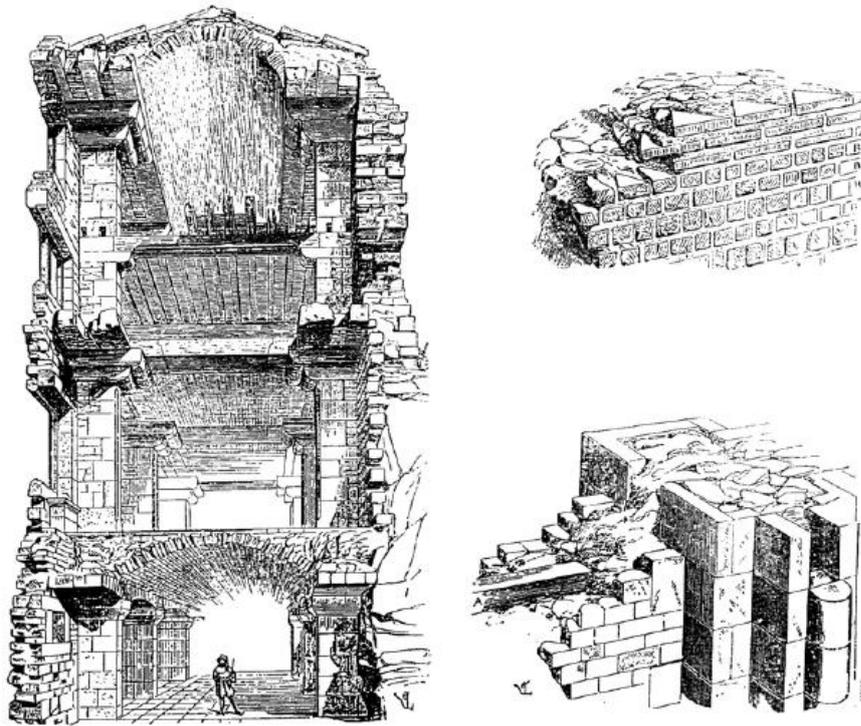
Constructive section through a medieval building. Details of the construction of roman and medieval walls (Viollet-le-Duc 1858)
